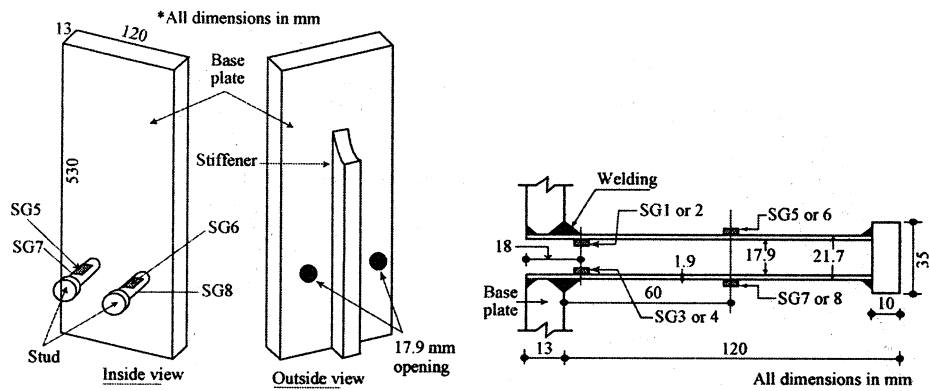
a Base plate with studs and stiffener Fig. 6-b Pipe stud with strain gages
